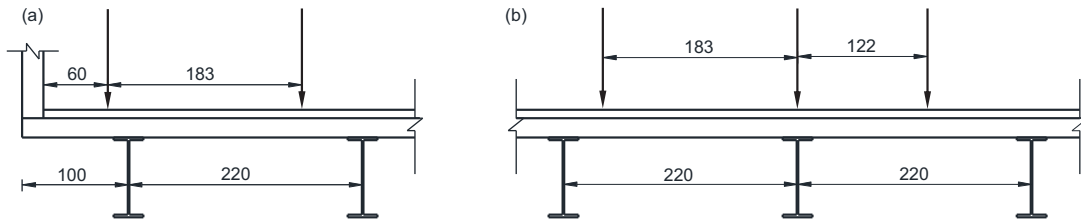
The transverse position of truck wheels associated with (a) exterior girder; and (b) interior girder for determining the lateral distribution factors (dimensions are in cm).
